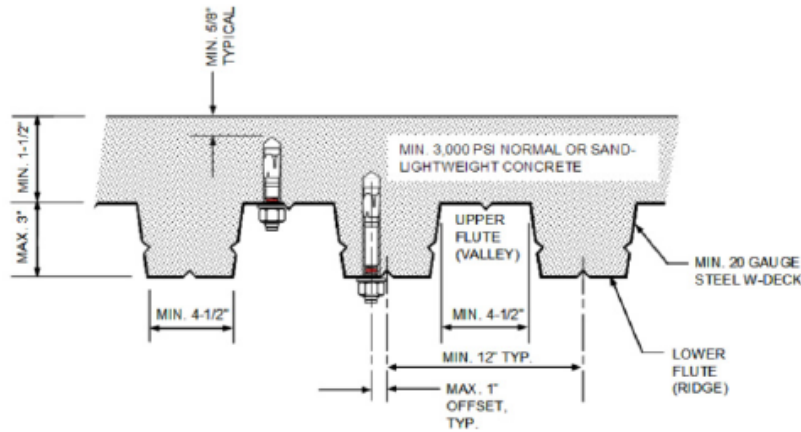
A—INSTALLATION IN THE SOFFIT OF CONCRETE OVER METAL DECK FLOOR AND ROOF ASSEMBLIES¹
